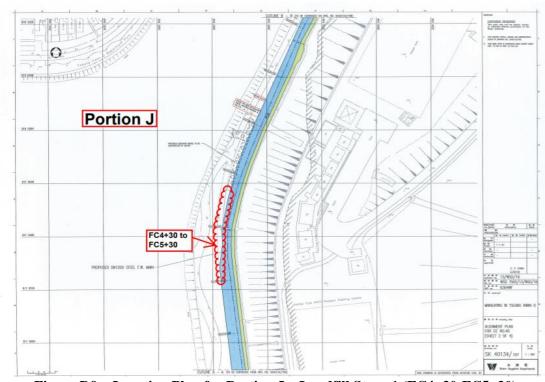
Location Plan for Portion J – Landfill Stage 1 (FC4+30-FC5+30)
